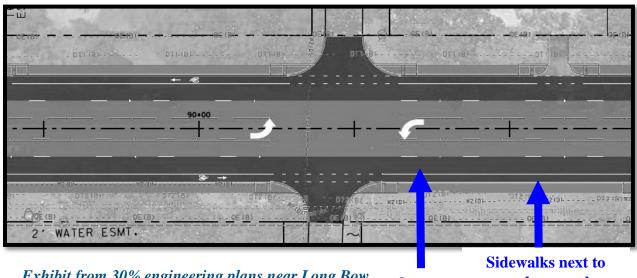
% engineering plans near Long Bow and NW Military Highway shows the on street bike lanes and curb sidewalks next to the roadway.
